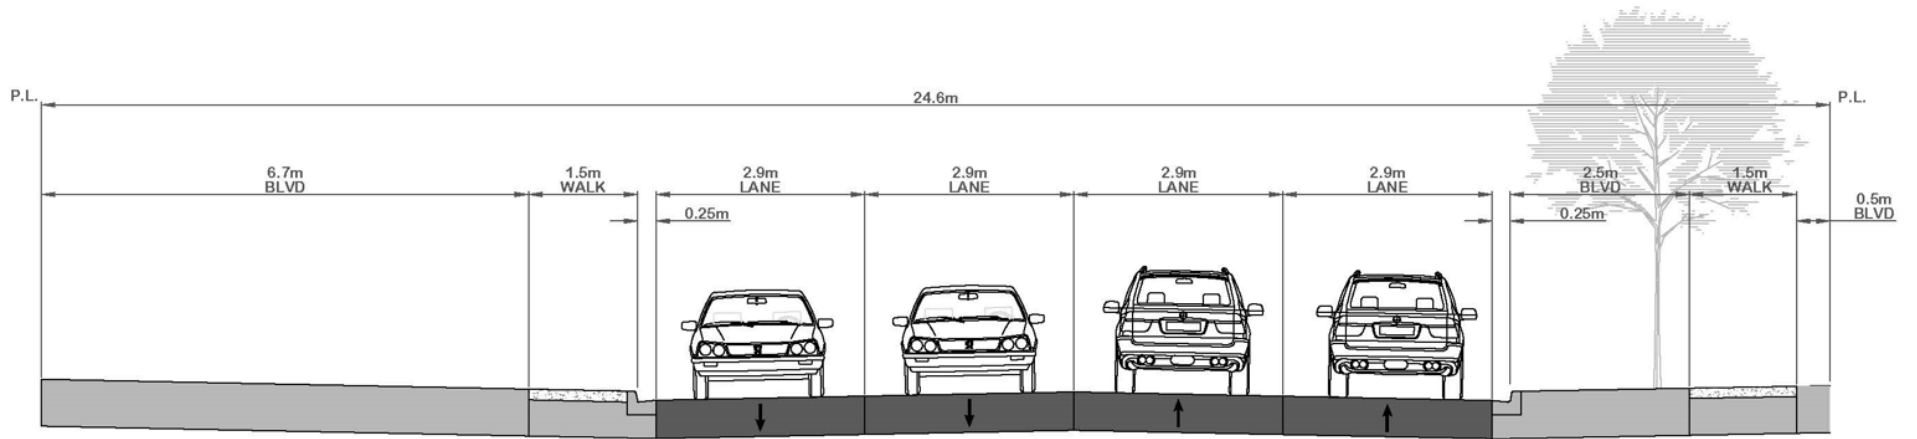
Existing Cross-Section of 3<sup>rd</sup> Avenue between Duchess Street and Duke Street (Facing North)
